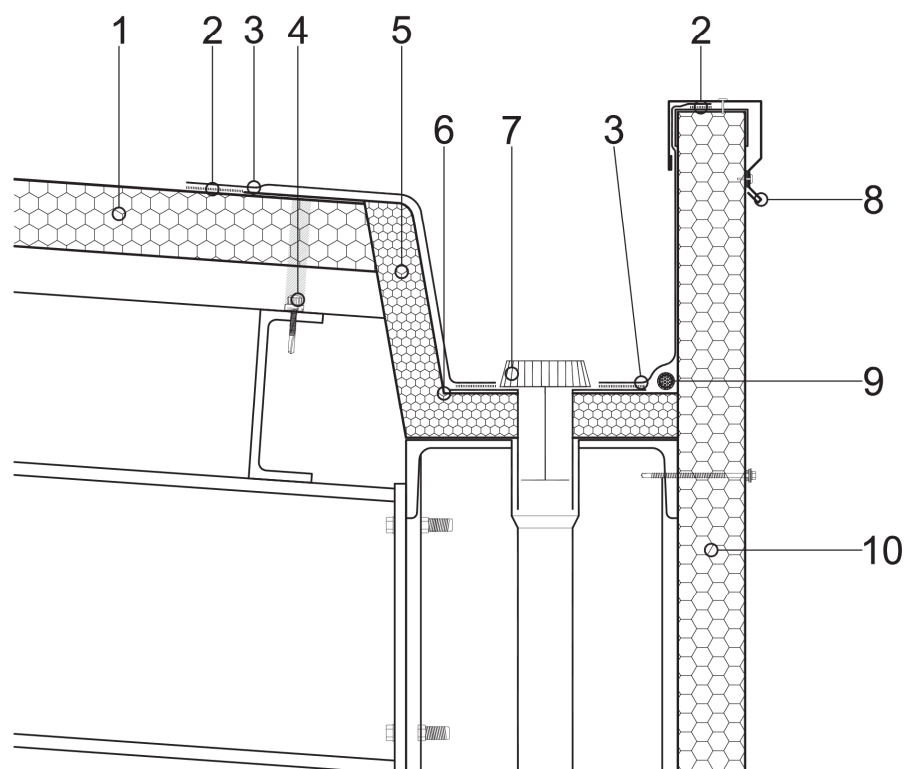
DETAIL OF GUTTER AND DRAINPIPE ON ROOF WITH SLIGHT SLOPE
